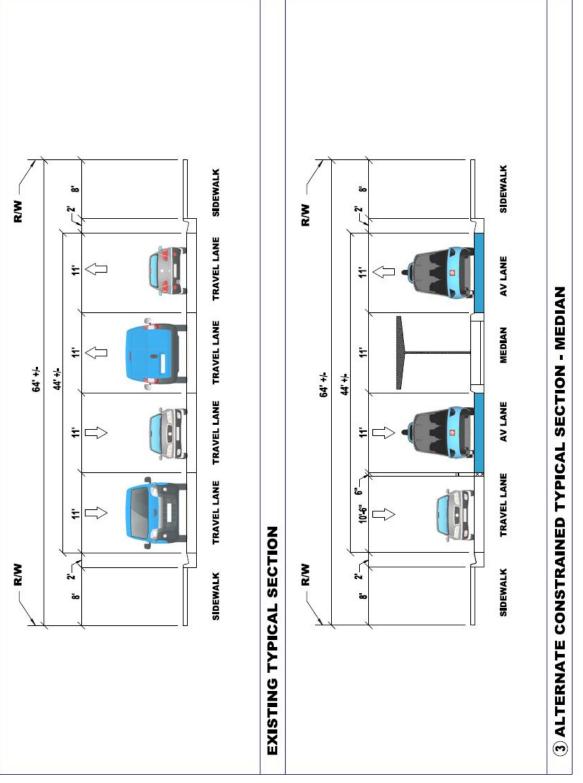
South Corridor Existing and Alternate Constrained Typical Sections with Median Station San Marco Blvd north of Nira Street
